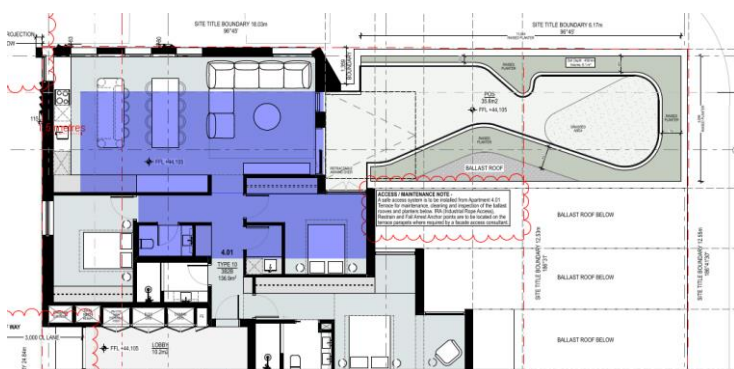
Excerpt of the floor plan for apartment 4.01- Council Officers have overlaid the potential area for the open living and kitchen in purple
